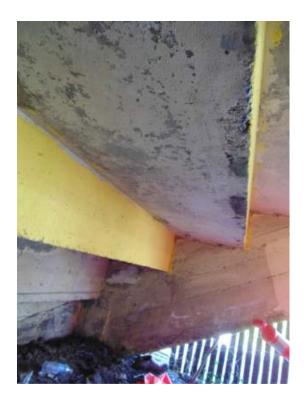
A: SPALLING/CRACKING/EXPOSED STEEL ON UNDERSIDE OF BEAMS
